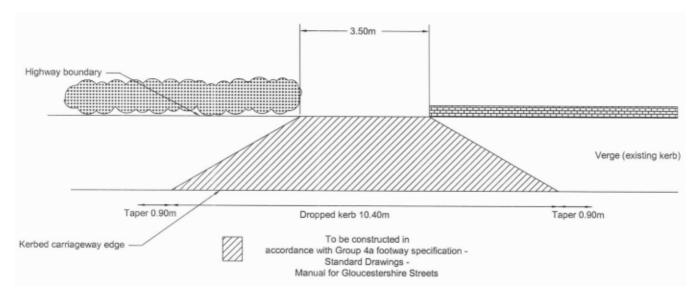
Standard access to 1 dwelling over kerbed highway verge.
